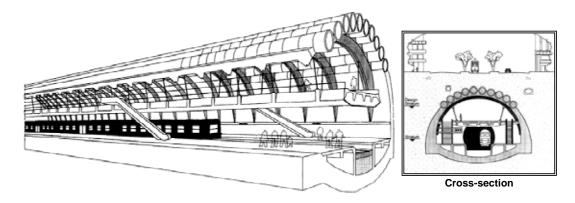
Longitudinal and Cross-sectional Views of Venezia Station (Lunardi, 1990)
